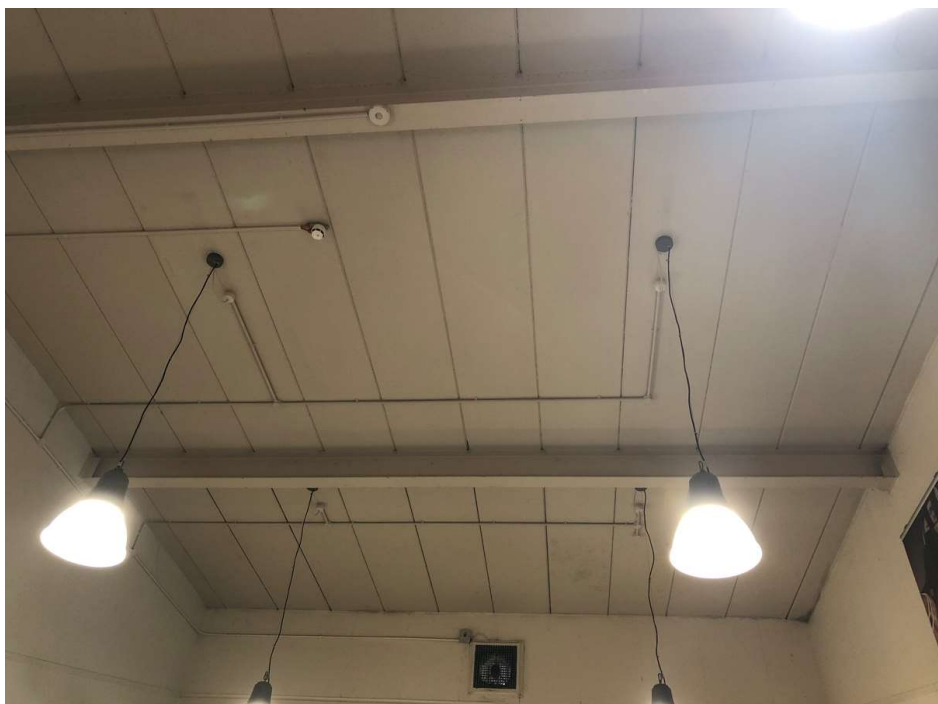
View on RAAC roof panels above fitness suite. The panels span up to 3.1m onto intermediate 254mm steel Universal Beams and onto the RAAC walls at the ends.
